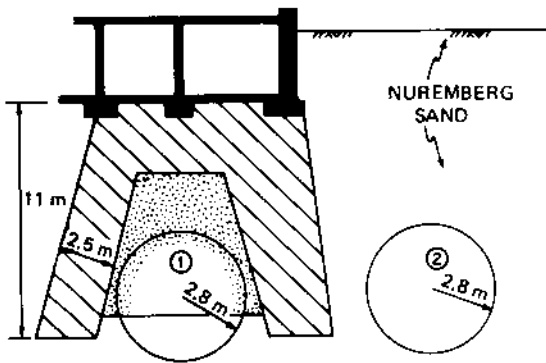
Typical section design for grout treatment. (From Ref. 8.)
